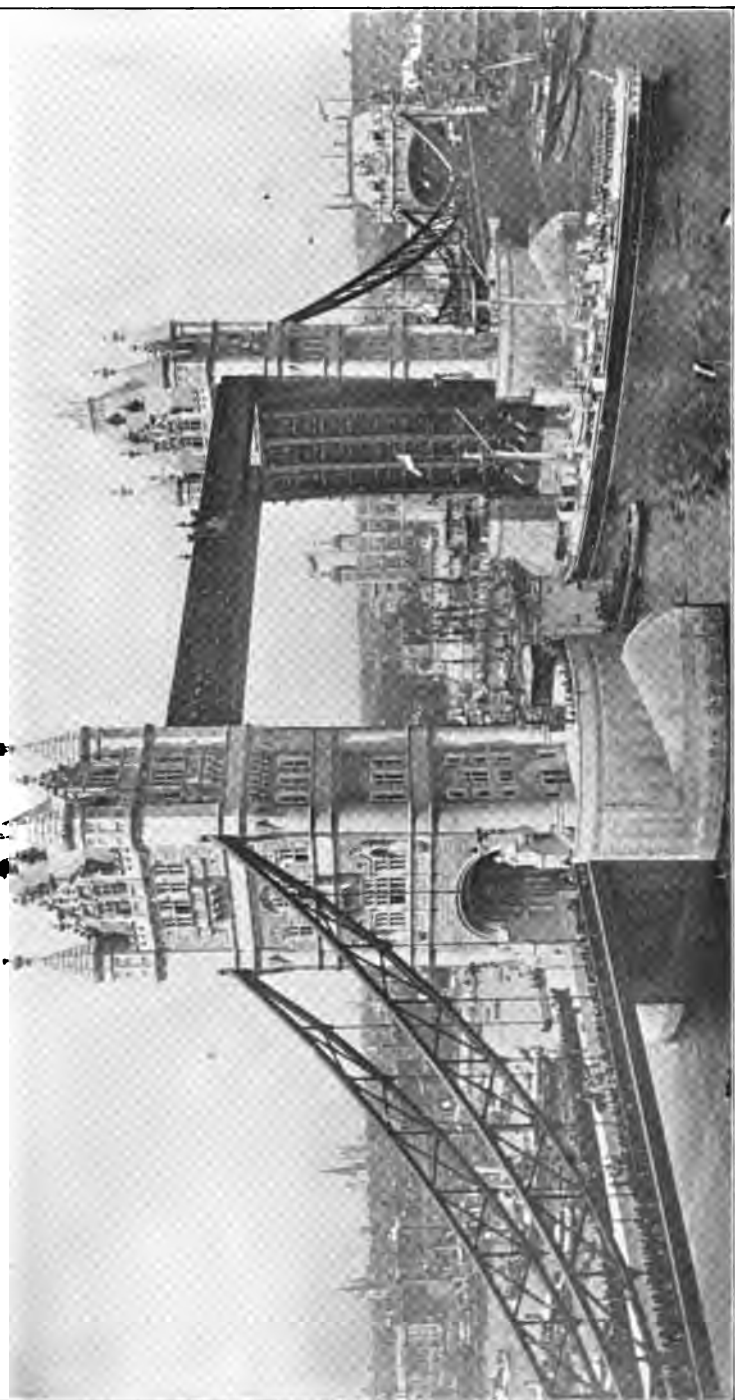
PLATE XI.—TOWER BRIDGE WITH BASCULE FULLY OPEN.
